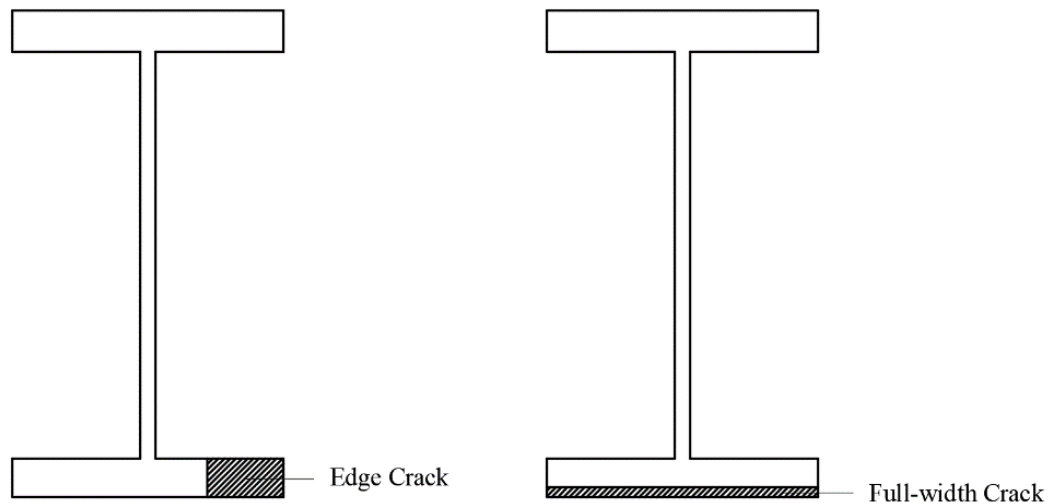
Crack Geometries Located in the Tension Flange of an I-shaped Member
